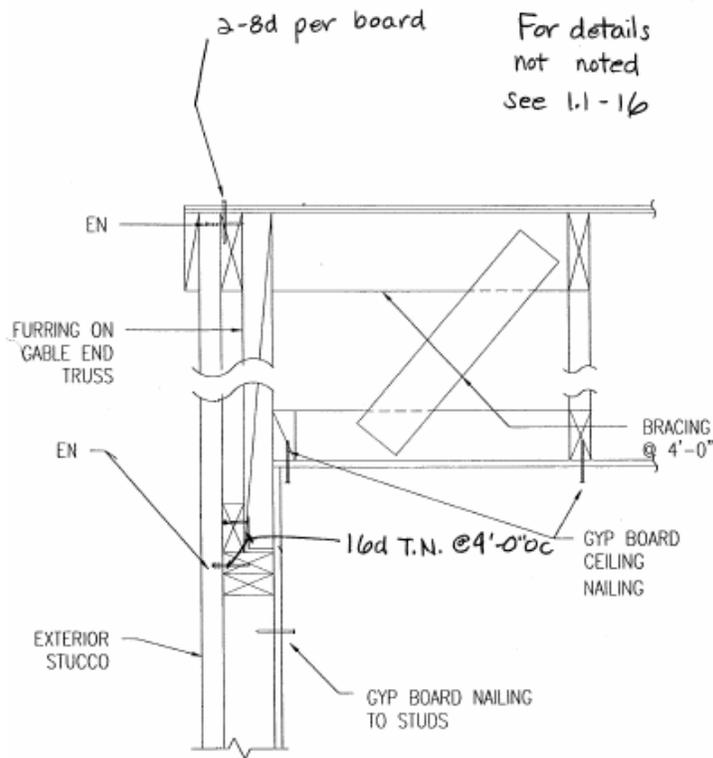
Index building 4 gable end roof high ceiling (detail 2A-S2)
